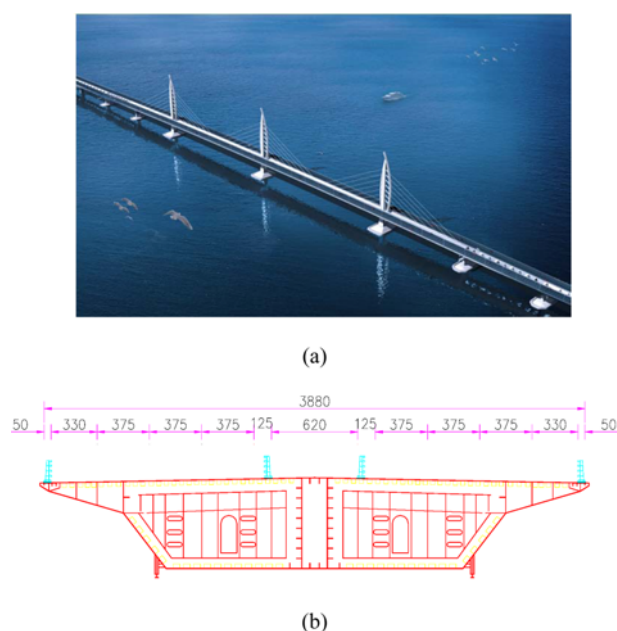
The Jianghai Channel Bridge: (a) Overview, (b) Dimensions of the Bridge Deck
